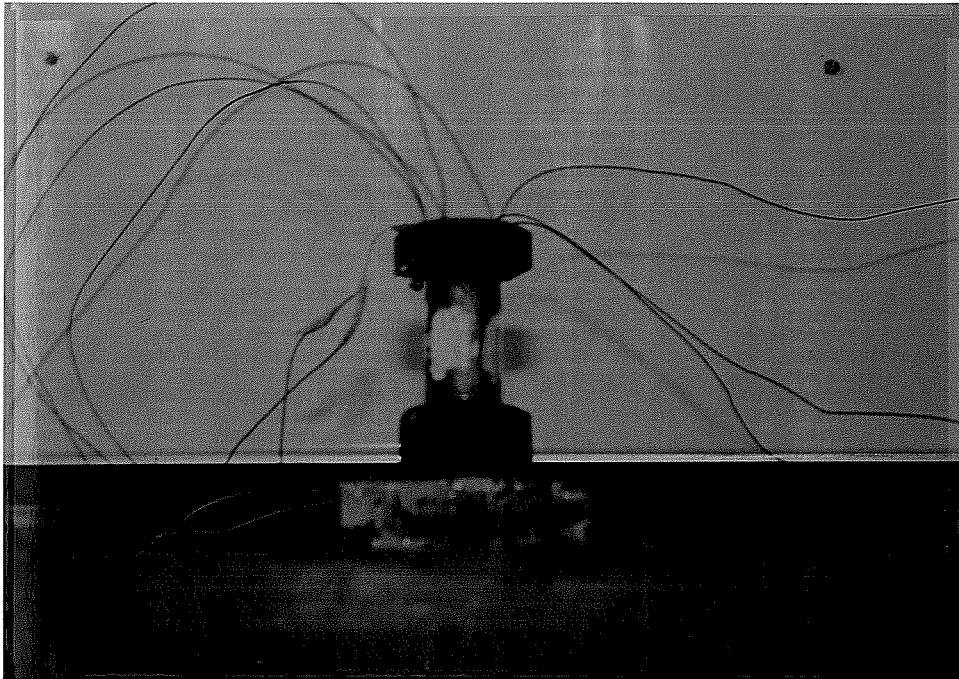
Conventional A325 fastener showing surface gauges and leadwires
